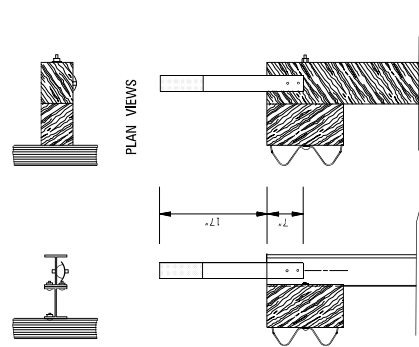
DETAIL OF FLEXIBLE GUARDRAIL DELINEATOR
